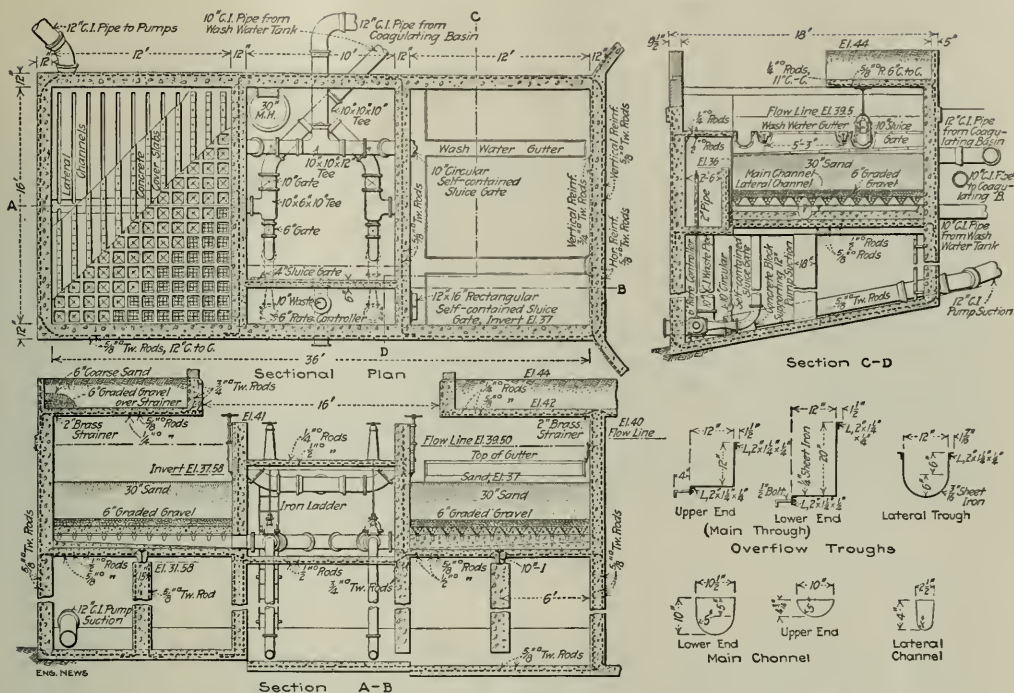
MECHANICAL FILTERS WITH WHEELER FILTER BOTTOM, BELFAST, ME.
